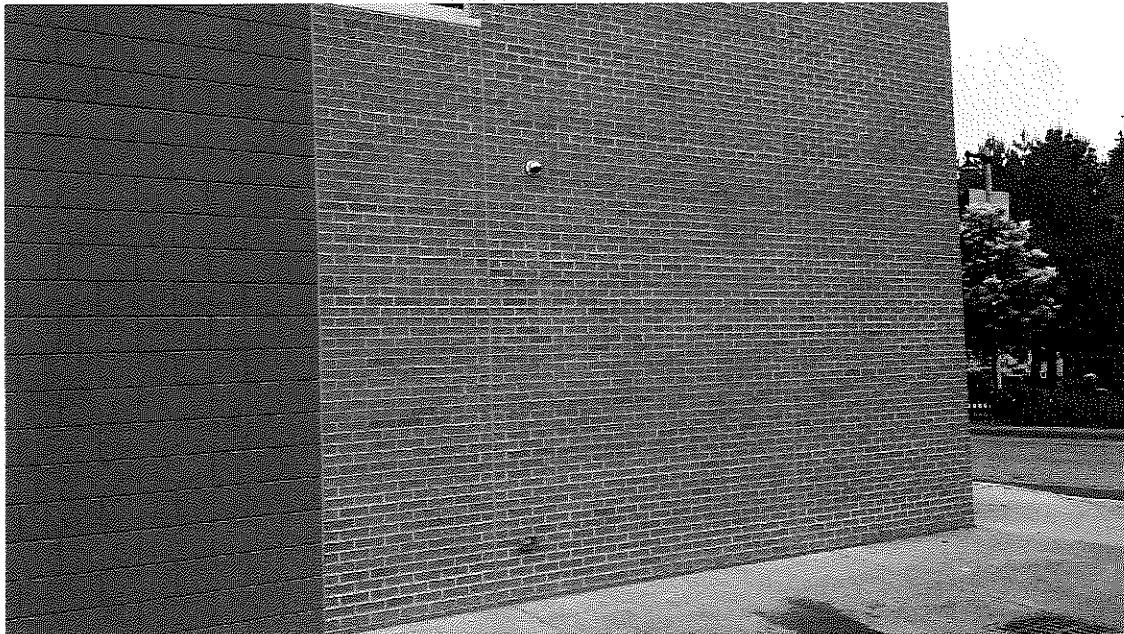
4" PVC subslab vent system exhaust point at west wall in the south half of the building after vent cover installed (view to southeast; June 12, 2015).
